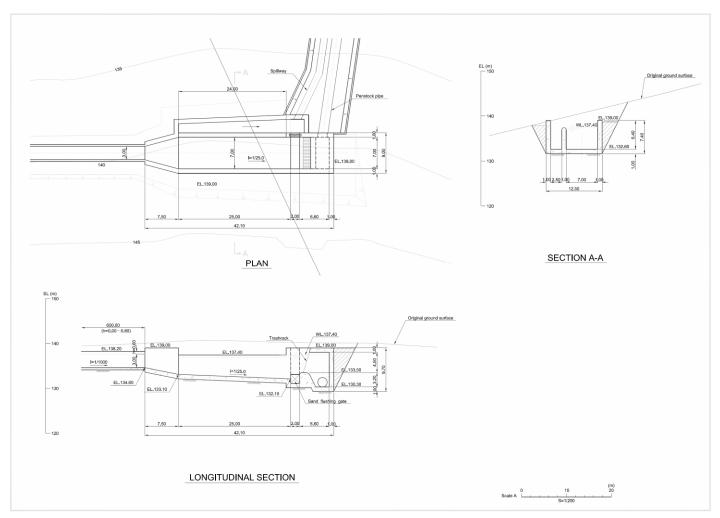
Plan and Sections of No.35-1 Head Tank
